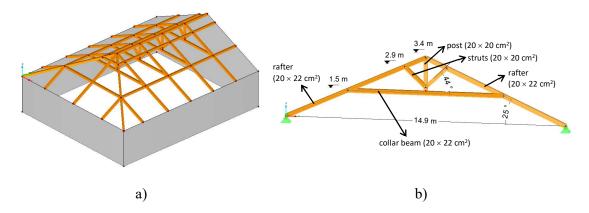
Configuration of the timber roof: a) three-dimensional perspective; b) planar collar beam truss.
